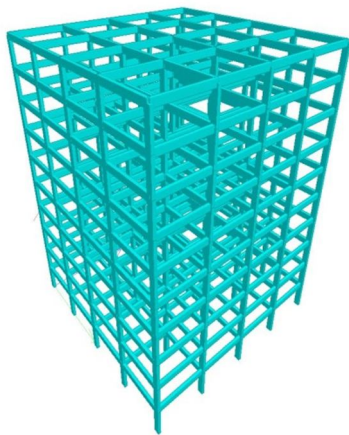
MODEL 1: 3D Rendering of Structure without Shear Wall
